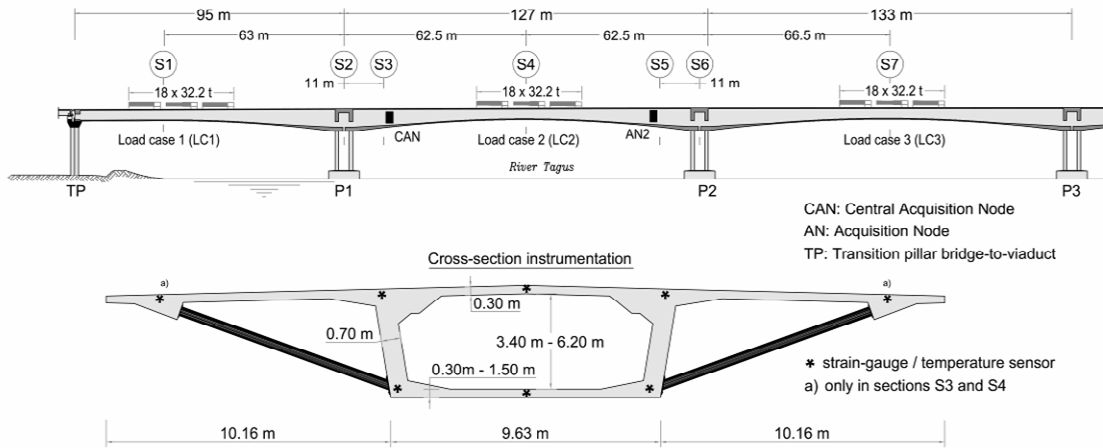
Location of the instrumented cross sections in Lezíria Bridge.
